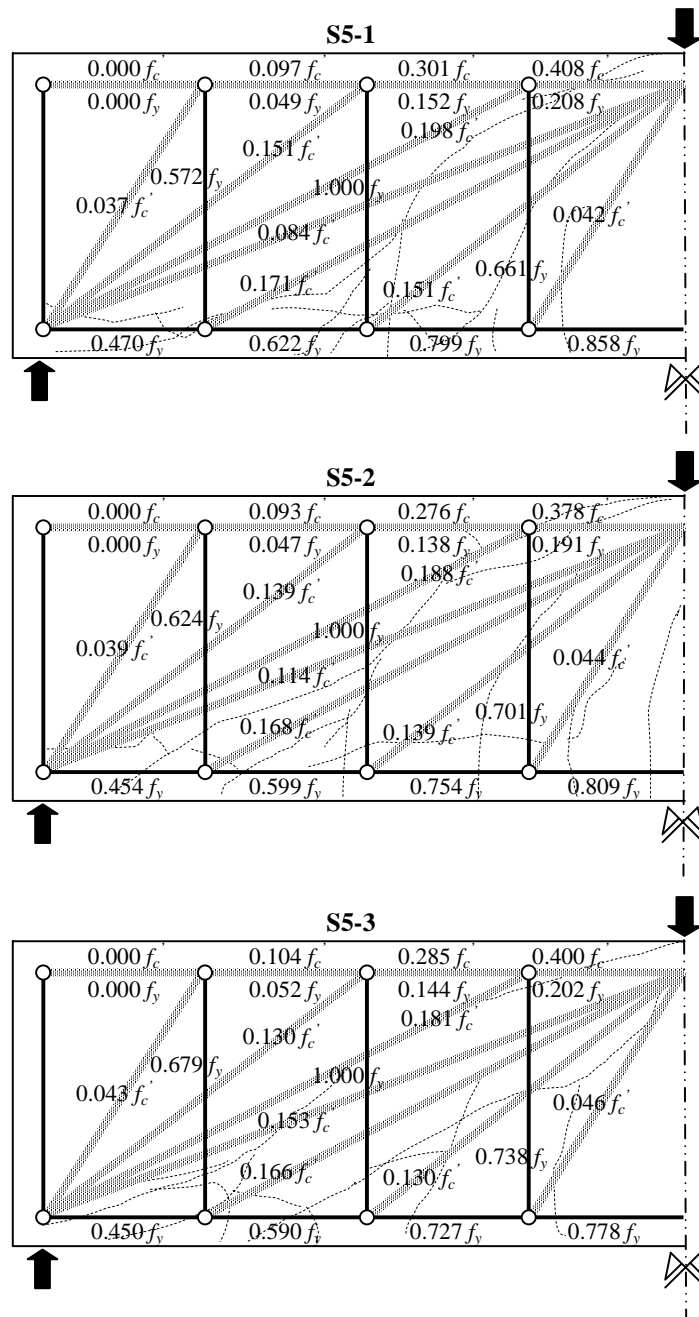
North shear span of the Series 5 beams with modified truss models
